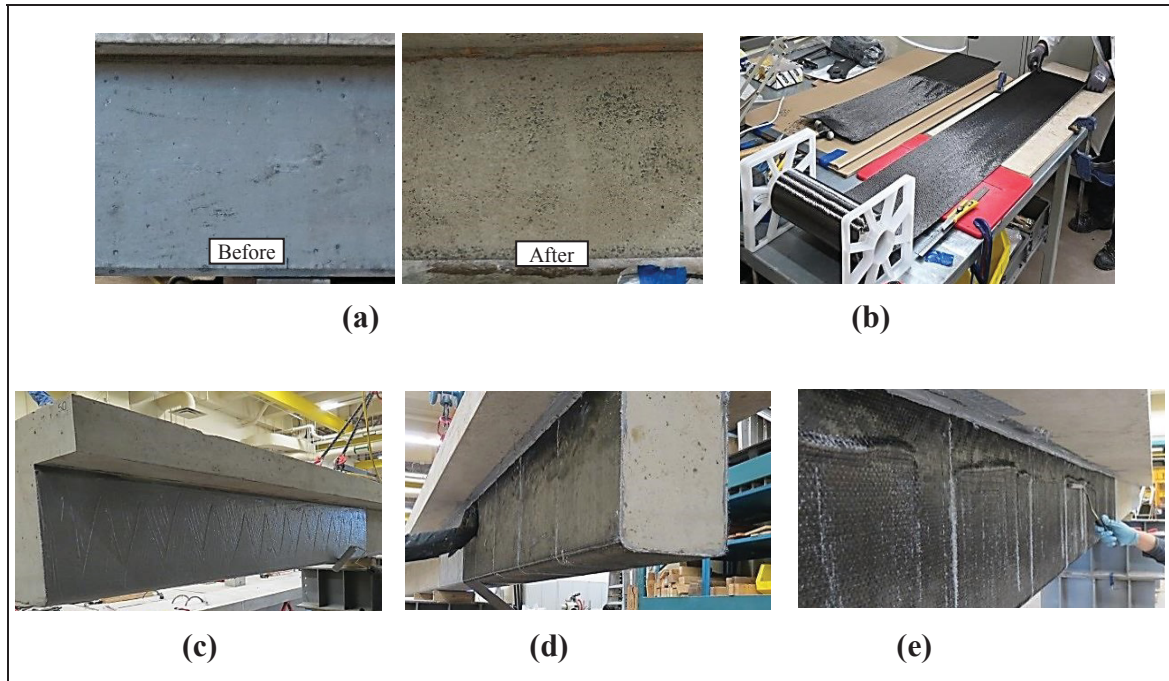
Strengthening procedure for typical specimen with U-wrap CFRP:
